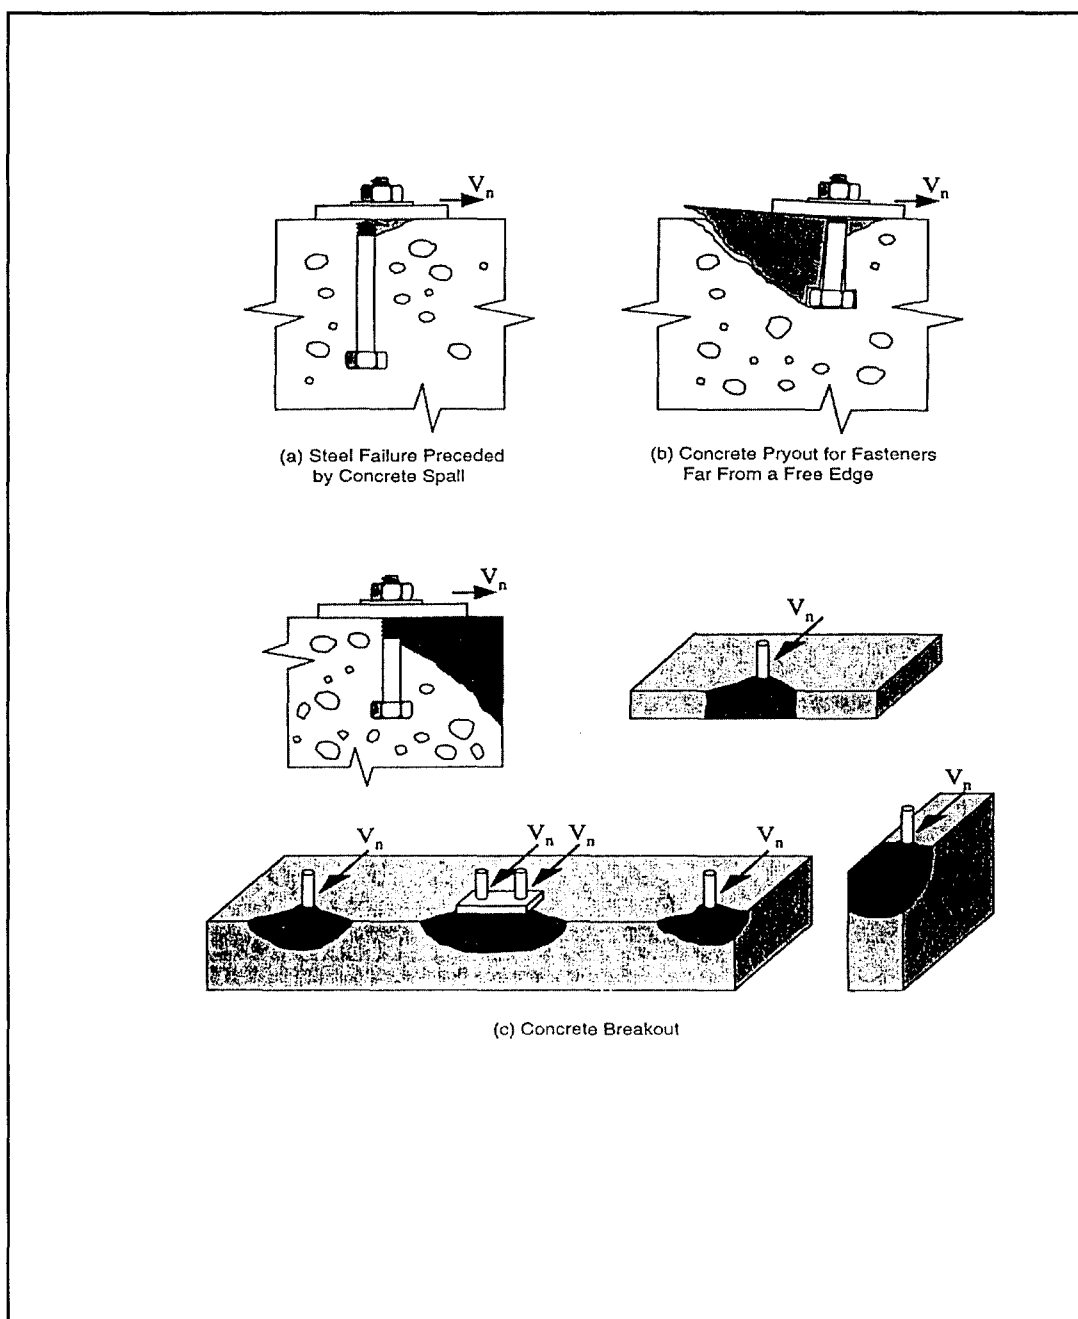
Failure modes for anchors under shear loading.
